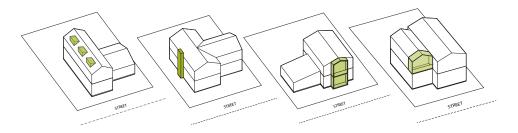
Additional building elements such as dormers, chimneys, verandahs and balconies help with street activation and break up mass. These are encouraged particularly on front façades that exceeds 12.0m in width.
